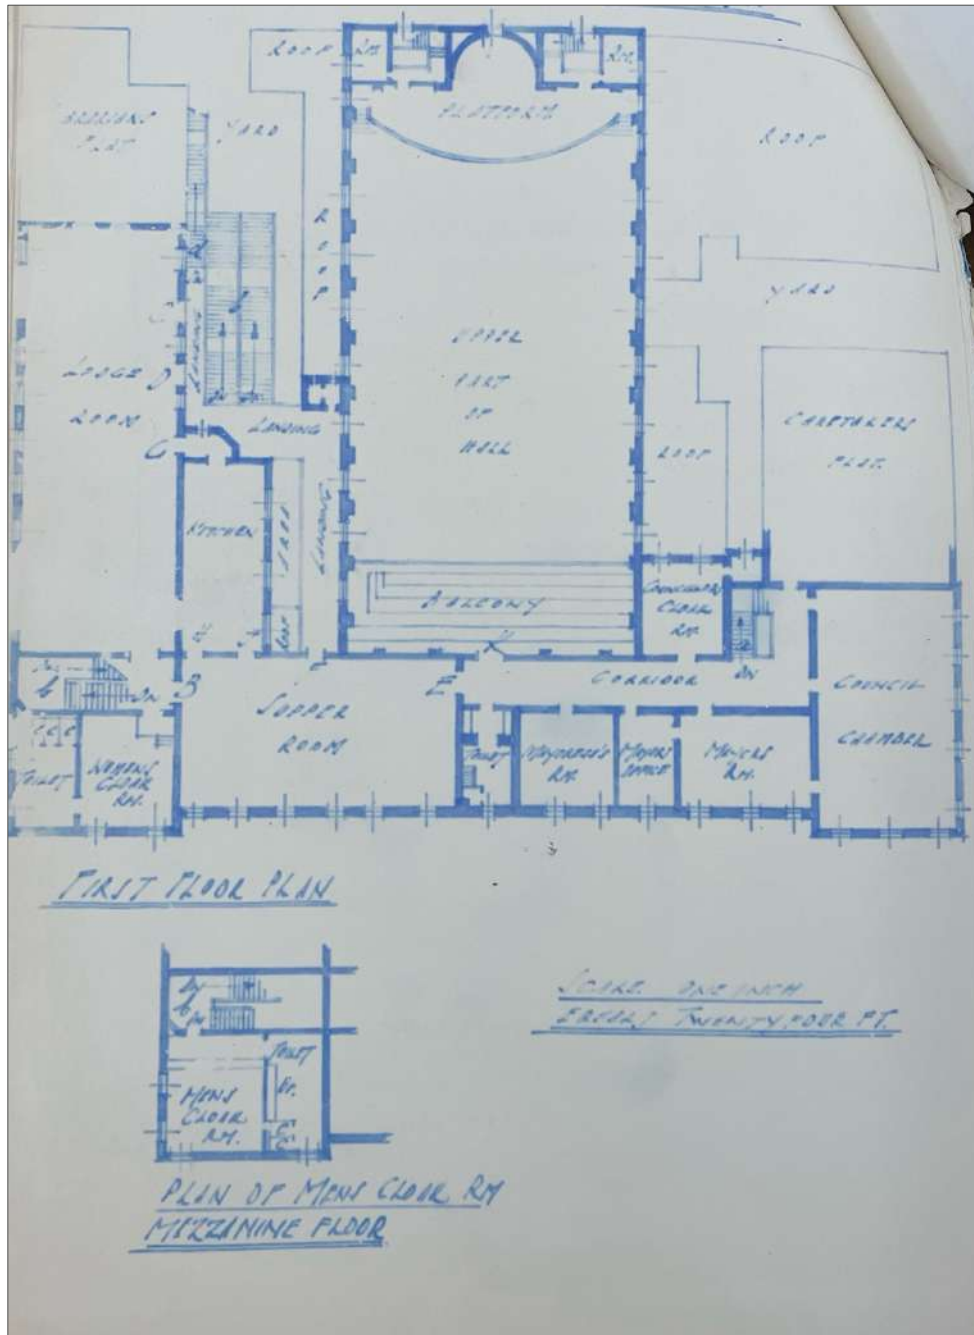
South Melbourne Town Hall first floor plan, 1940. Source: Public Record Office Victoria.
